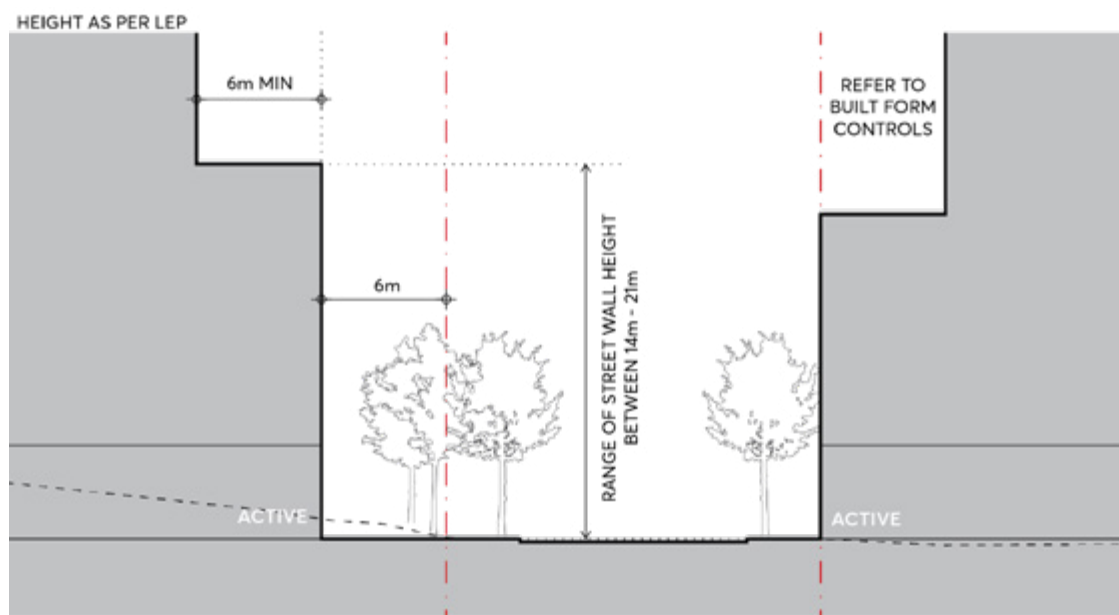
Campbell Street (Section B) Setbacks and Street Wall Height
